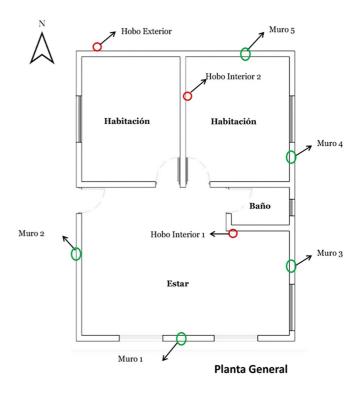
General floorplan of the dwelling with the HOBO layout and wall designation. Source: Preparation by Costantini Romero.
